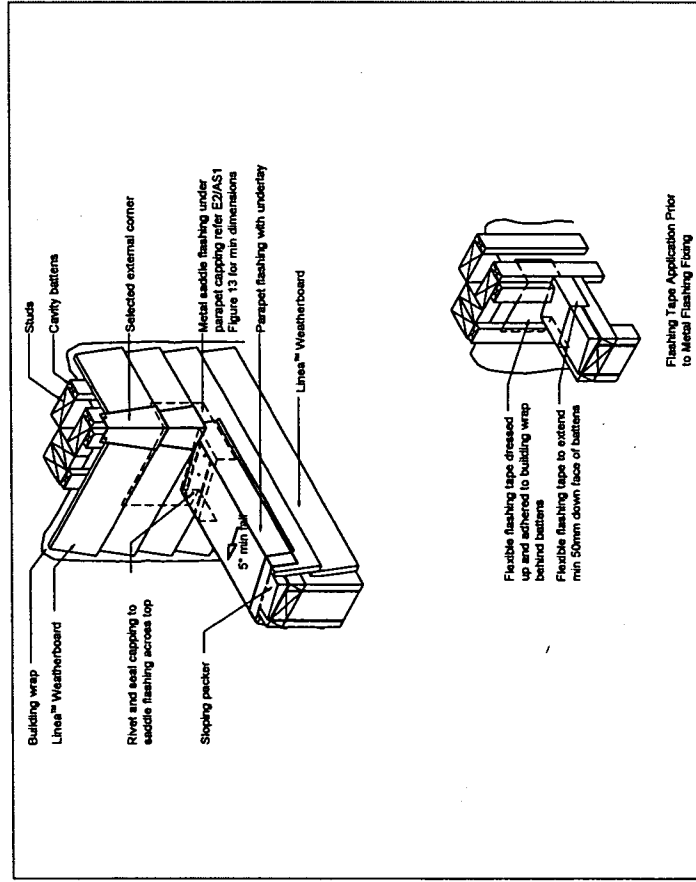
CAVITY ENCLOSED BALUSTRADE TO WALL
